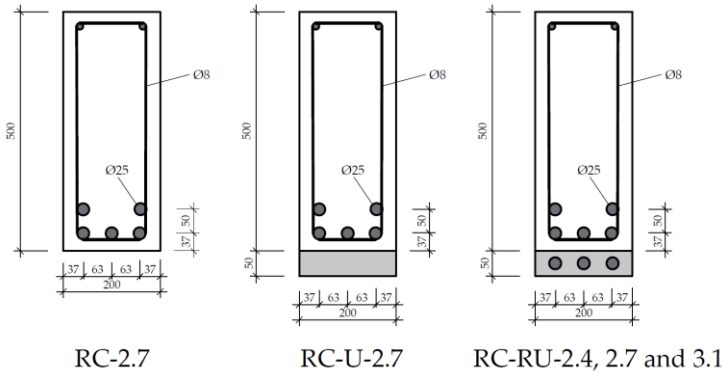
Experimental beam specimen cross-sections (Ji & Liu, 2020)
